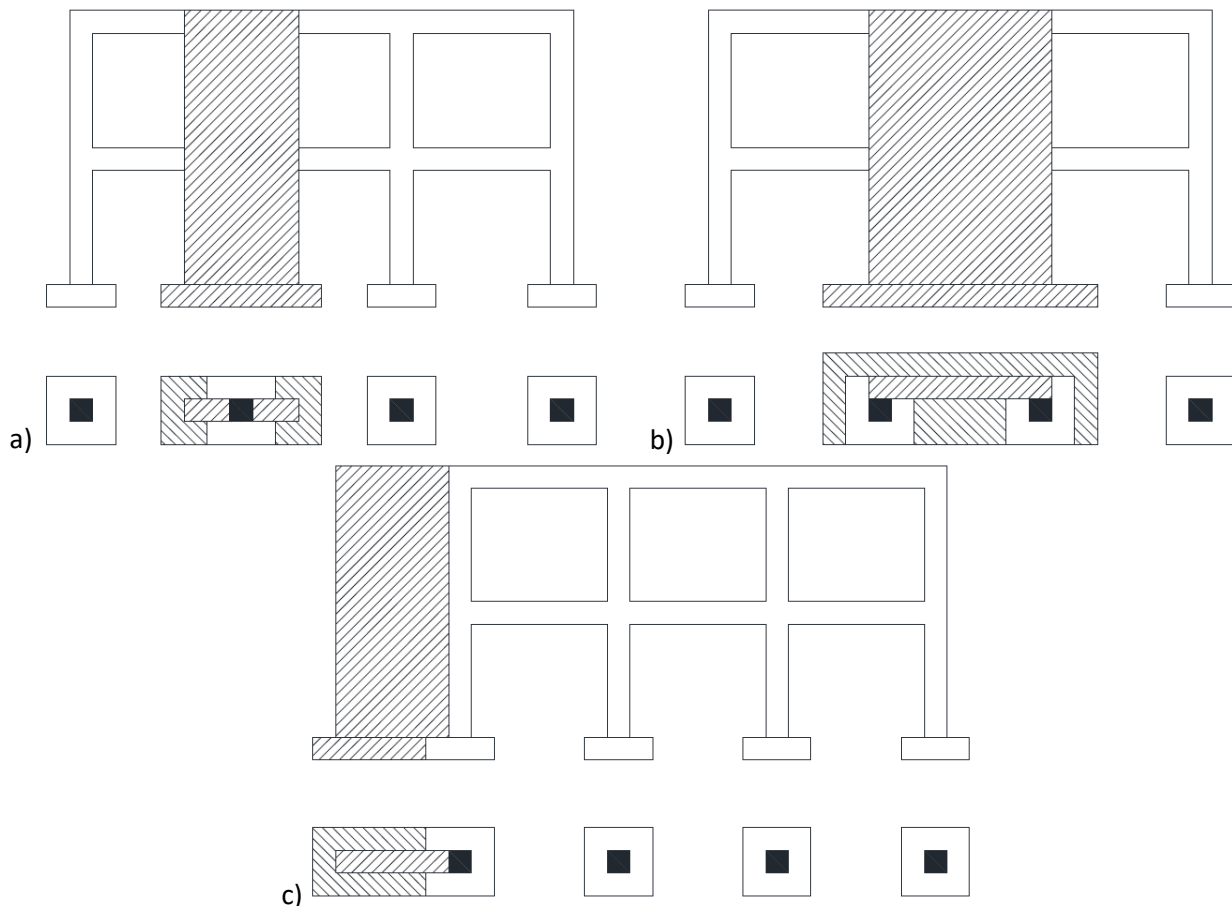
View and cross-section above the foundation of RC frames strengthened with new RC walls placed: a) around a column; b) external to the frame; c) as buttress – Source: [27]
